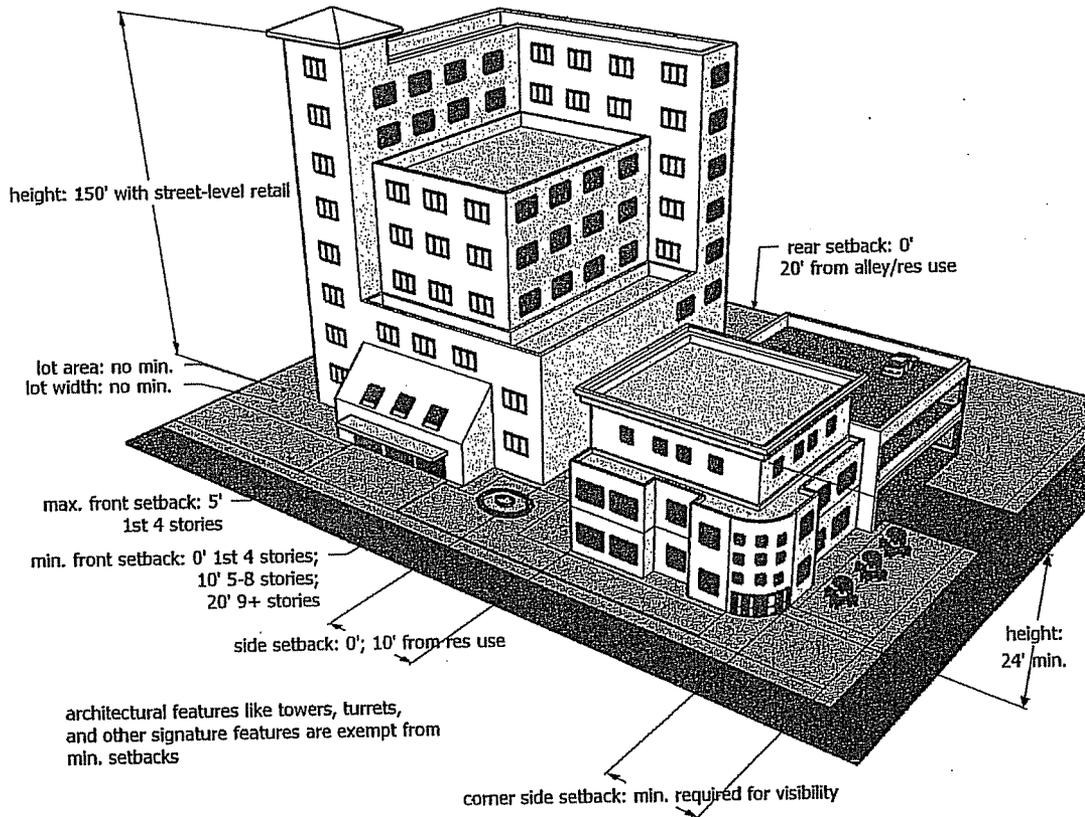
<=>: DT Typical Building/Lot Configuration (reserved)
